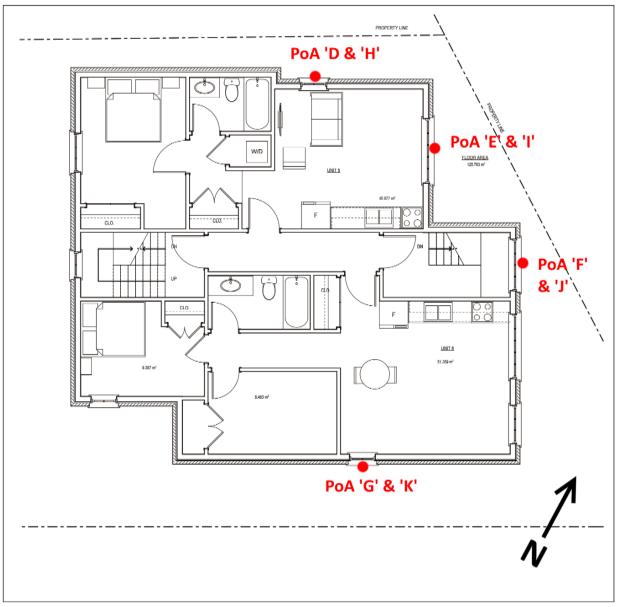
Site plan showing location of Points of Reception POA 'D' through 'K' on Floors "Ground" and 2 of Building 'A'.
